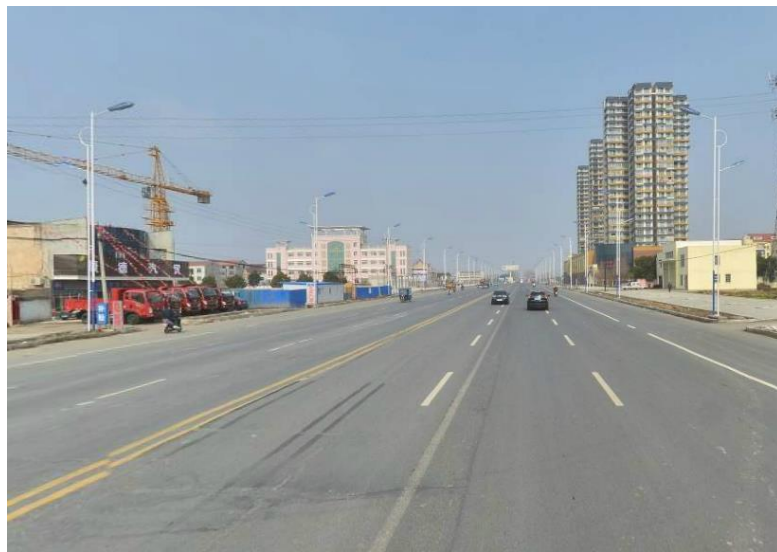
Sectional View of Existing Six-lane Taibai Road (from Yinxing Avenue to Anwei Bridge)
